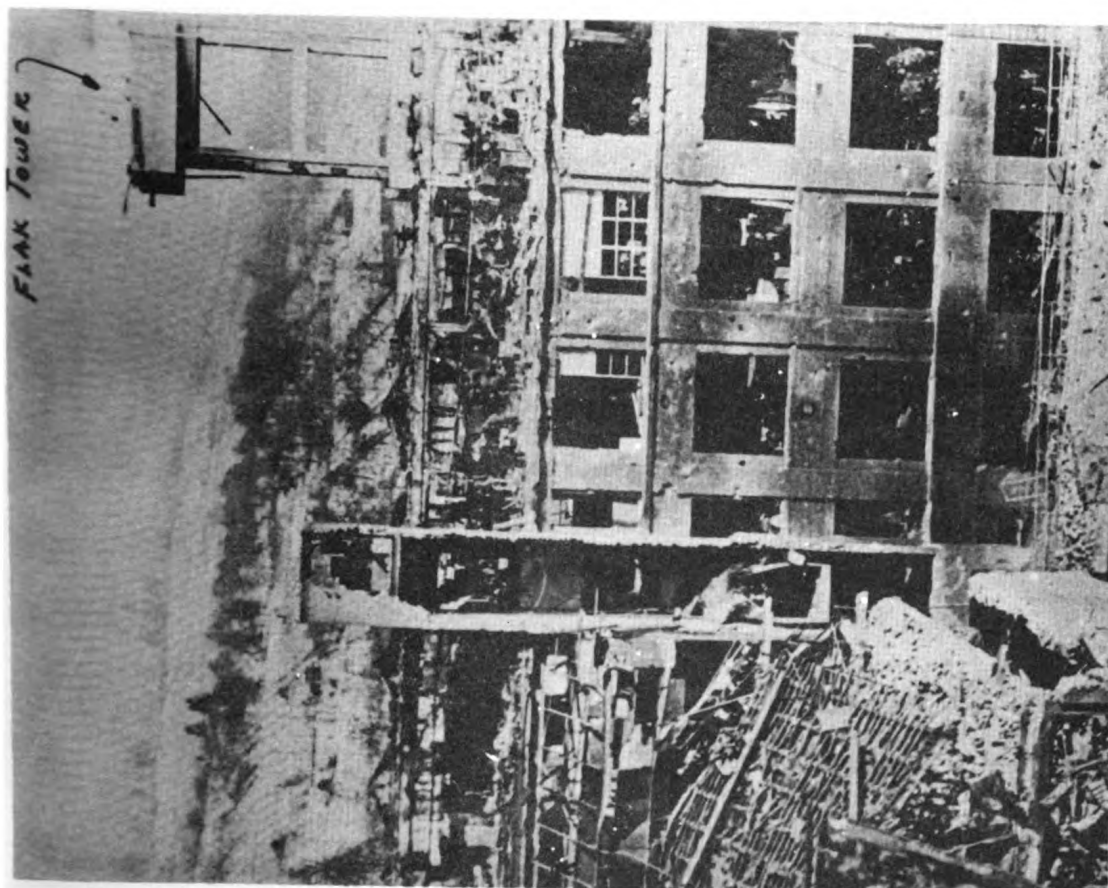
Extensive blast damage to upper floor area and machines and equipment. Note damage to elevator shaft, and superficial damage to large openings due to probable blast and fragmentation. Note flak tower. Reproduction of captured photo.
